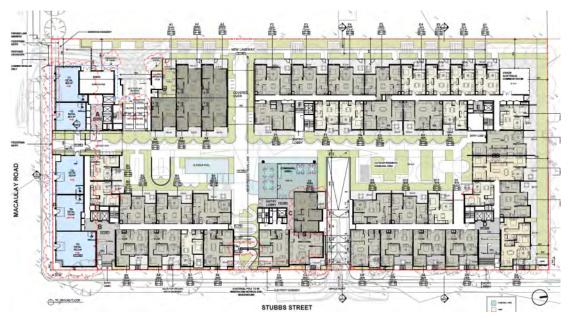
Proposed Ground Floor. From Drawing TP01.04
